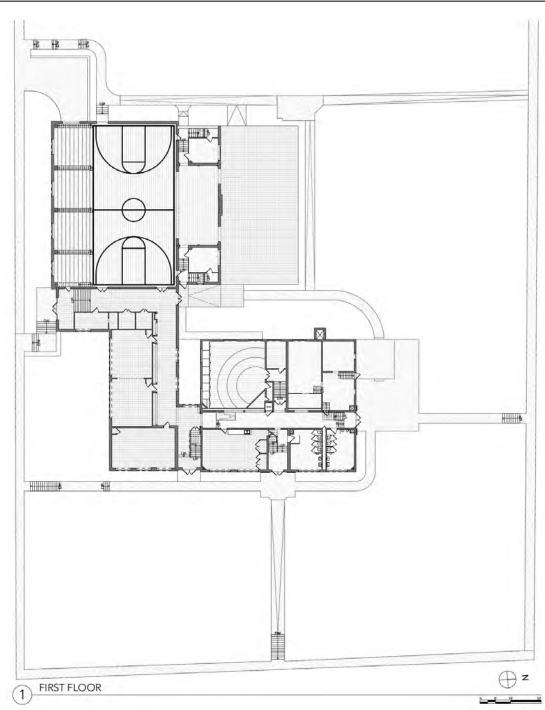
Current first floor plan of Hermann High School. Drawn by Adam Davenport. Graphic scale included
